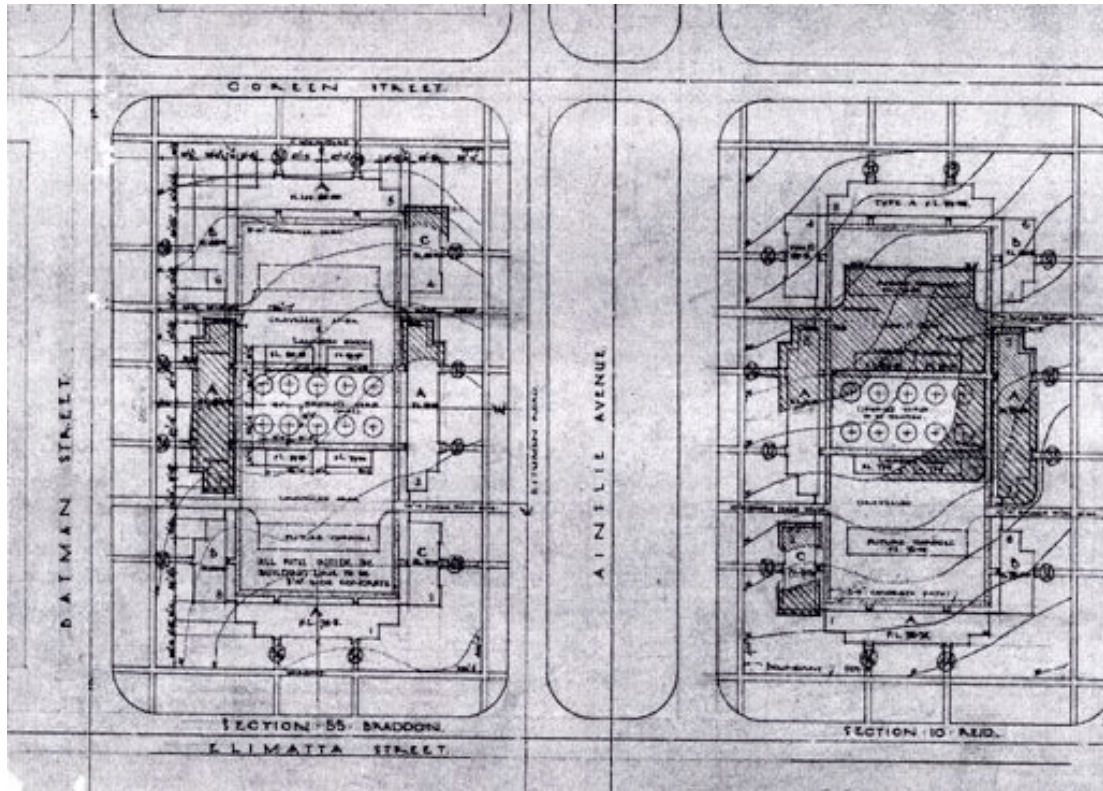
Site plan, Braddon and Reid Flats, Department of Works and Housing, Canberra, c 1950. National Archives of Australia, NAA: A2617, Section 35/17517A.
